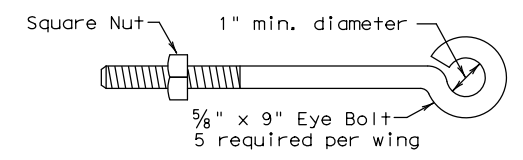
DETAIL OF GATE HINGE BOLT ASSEMBLY
